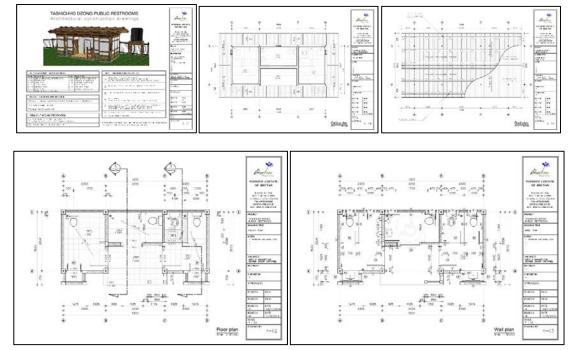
Construction drawings of Tashichho Dzong public restrooms
